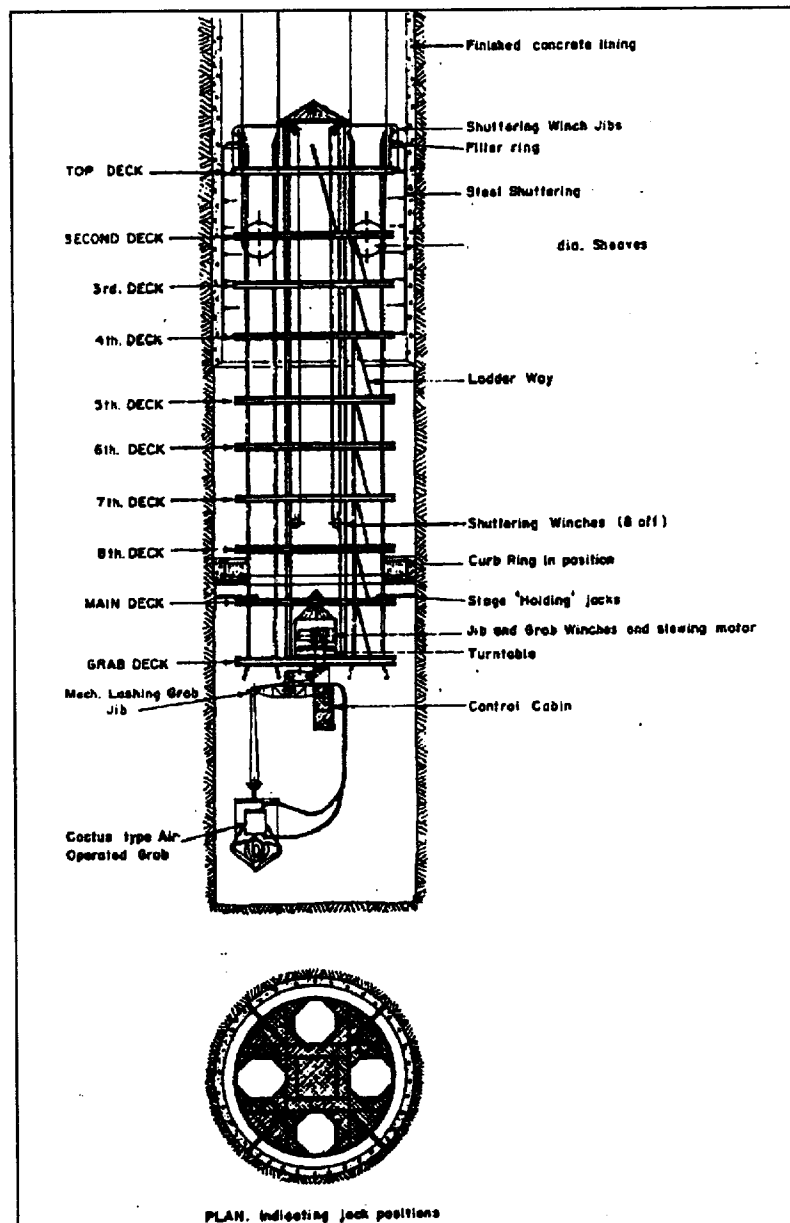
Sinking Stage - Supported on Eight Falls of Rope
